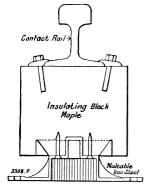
Contact Rail and Support, Chicago Elevated Railway.
